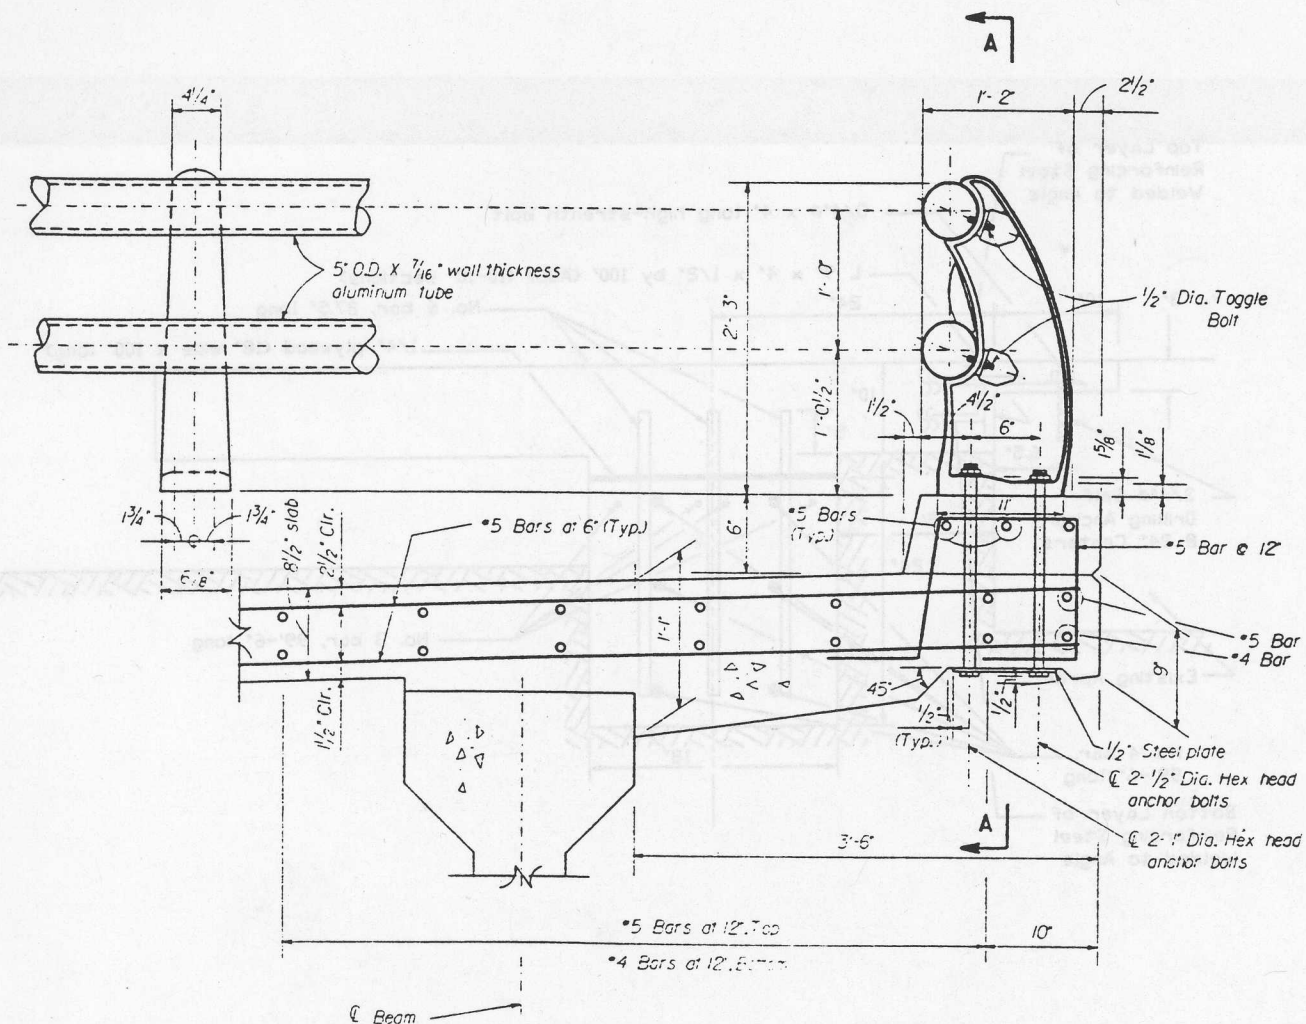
Design Details of the Foothills Parkway Bridge Rail for Test FPAR-3
